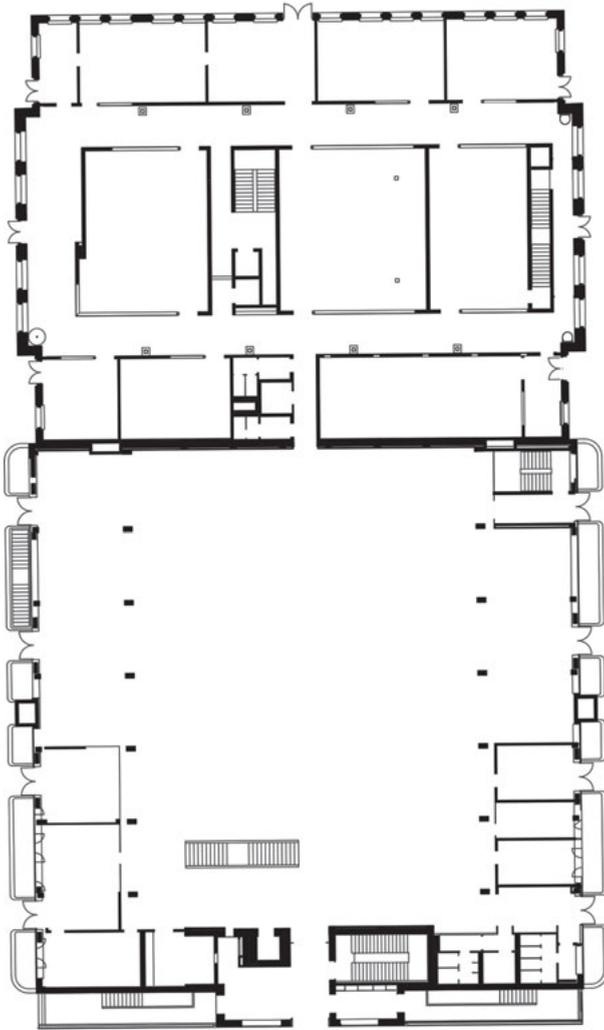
Ground floor plan. © Nickl & Partner Architekten.
